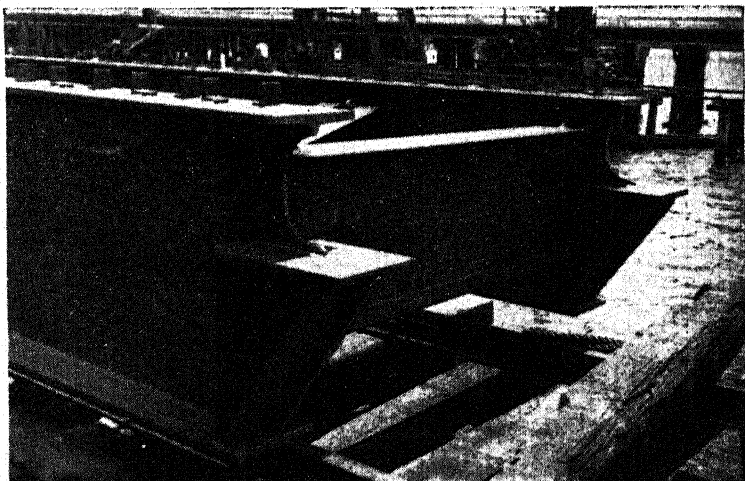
Ends of three-span girders with supporting bracket which cantilevers out 1' 3".
